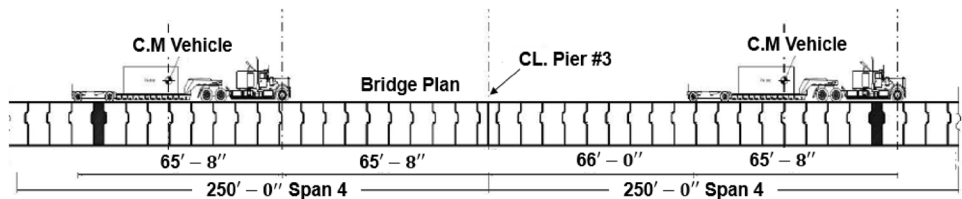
Aerial view of the bridge for the maximum negative moment at Pier #3
